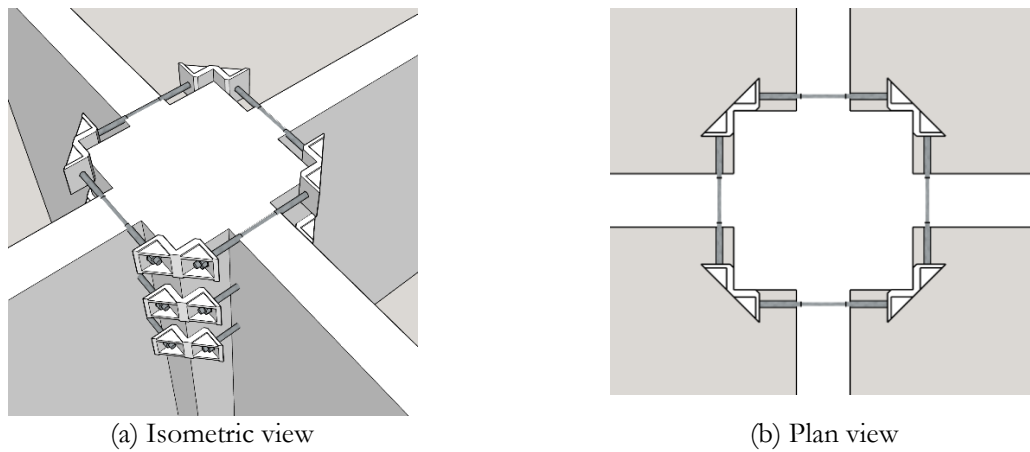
Typical installation of the steel-rod collar system with masonry walls.
